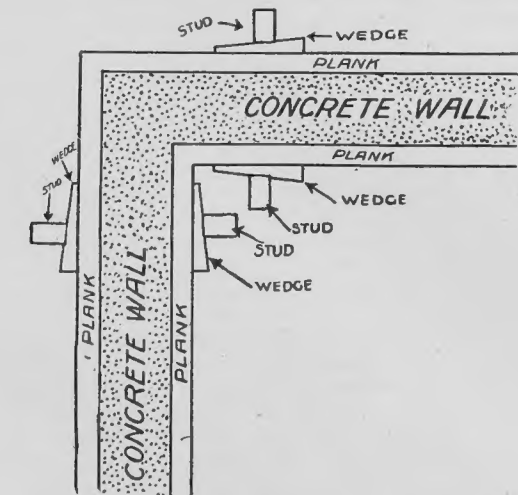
Corner Concrete Wall, showing Planking and Supports.
